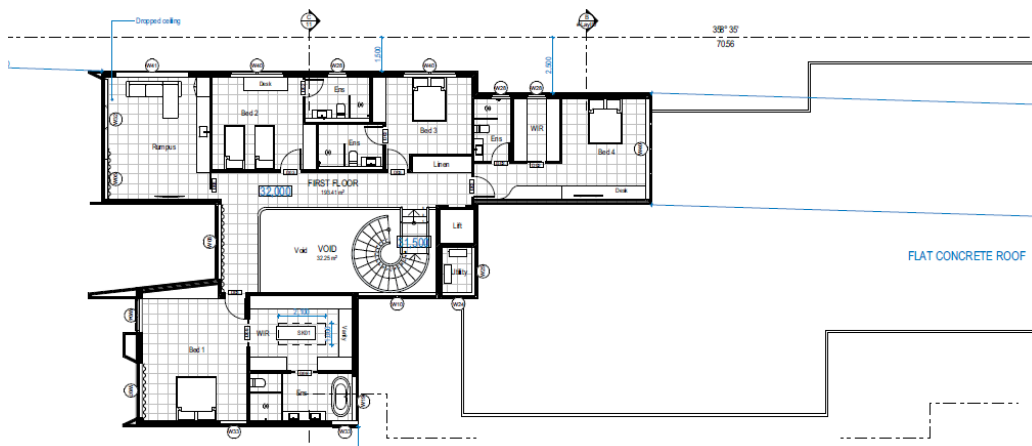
Refused First Floor Plan and s8.2 Review First Floor Plan (No Change)
